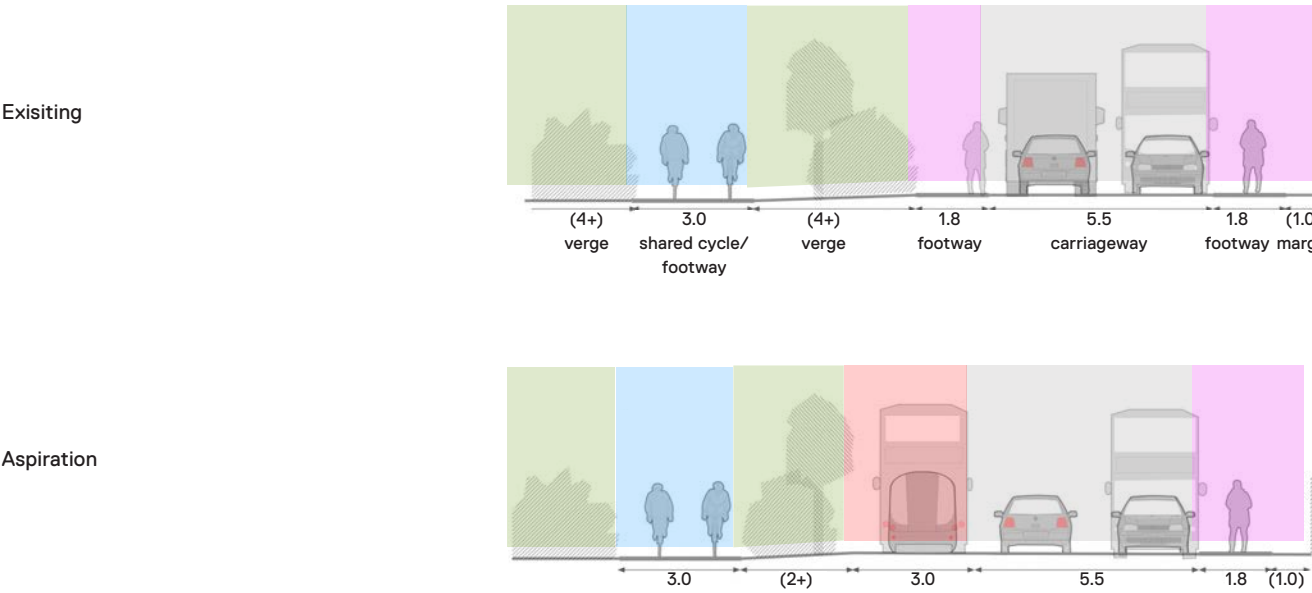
Section B the northern perimeter road to Station Gateway
